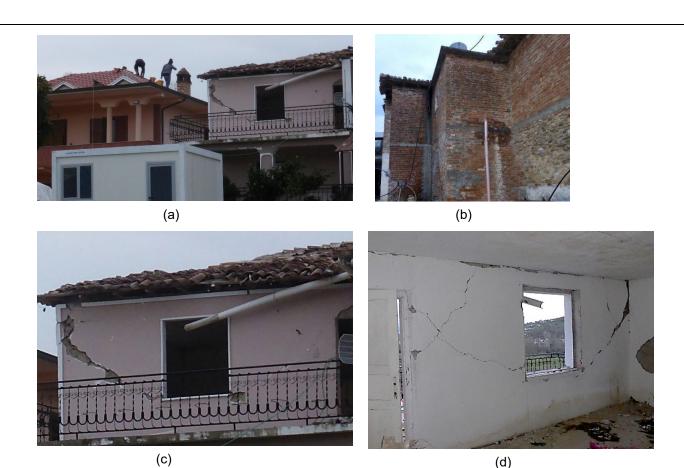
Damaged single-family URM house in the Bubq village: (a) the front façade of a damaged URM building (right) and an adjacent reinforced concrete frame building that remained undamaged (left), (b) a rear view of the house revealing building extensions, (c) a damaged exterior wall at the second floor (exterior view), and (d) an interior view of the same wall (photos: SUZI-SAEE).
